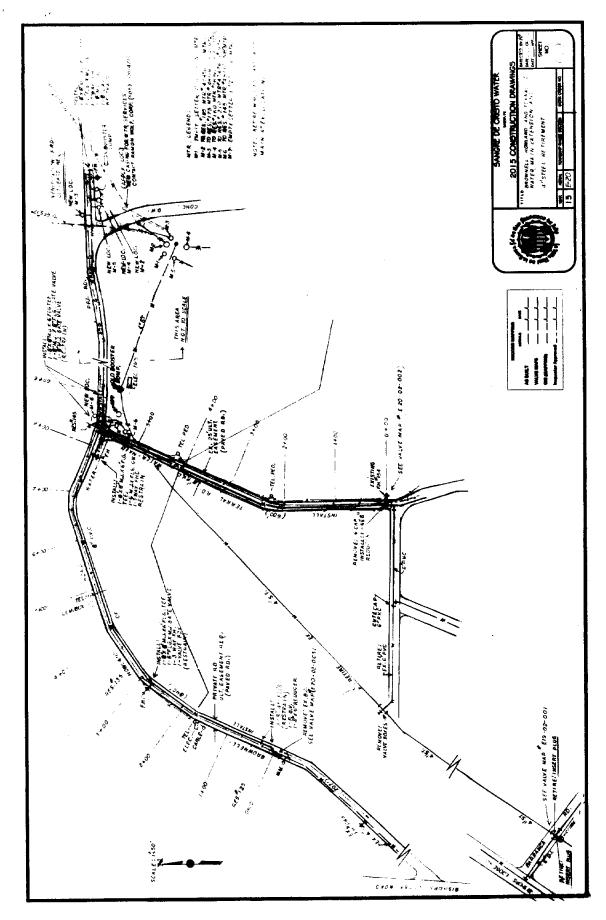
Construction Drawings, Brownell-Howland Road and Terral Road
